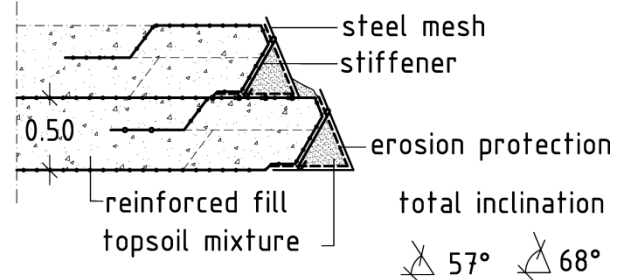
Wrap-back wall with outer facing made of corrosion-resistant vegetation supports, System Delta-Green
